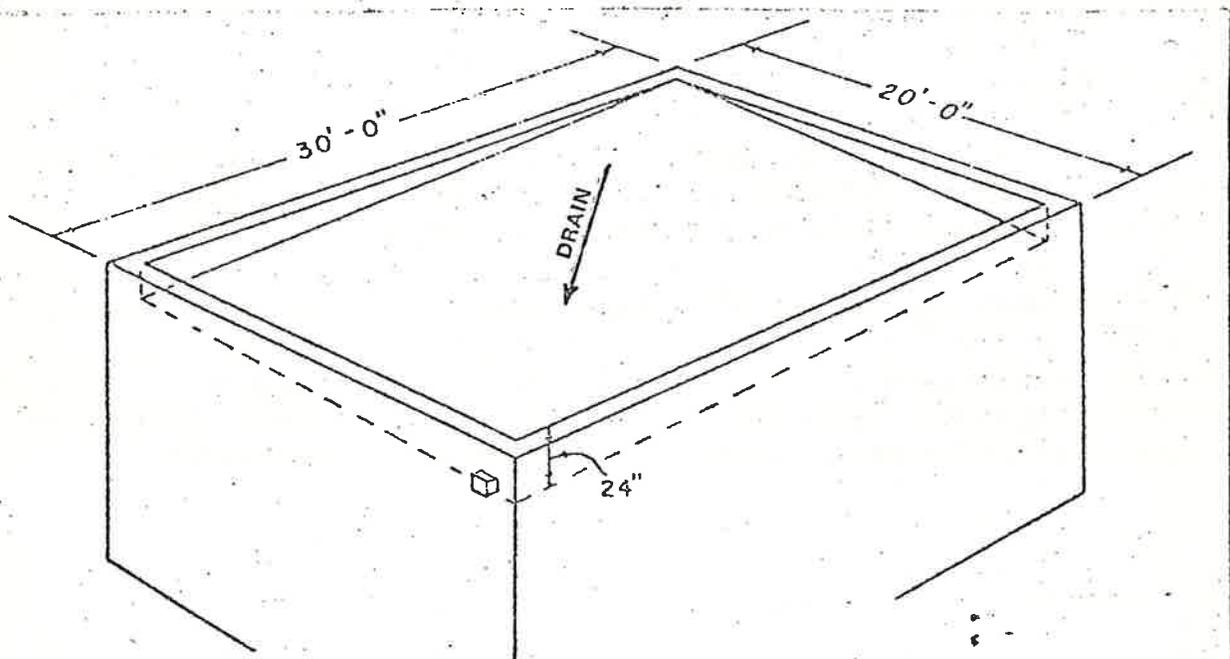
Flat Roof Sloping to Top Edge of Parapet Wall
